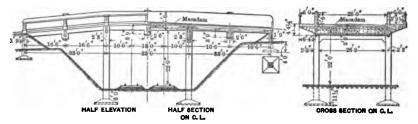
Concrete Overhead Bridge, L. & N. Ry.
